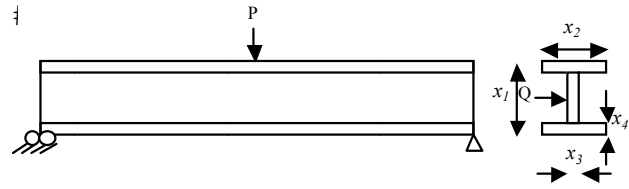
The parameters for the I-beam design. Left: Longitudinal section of the beam. Right: Cross-section of the beam.
